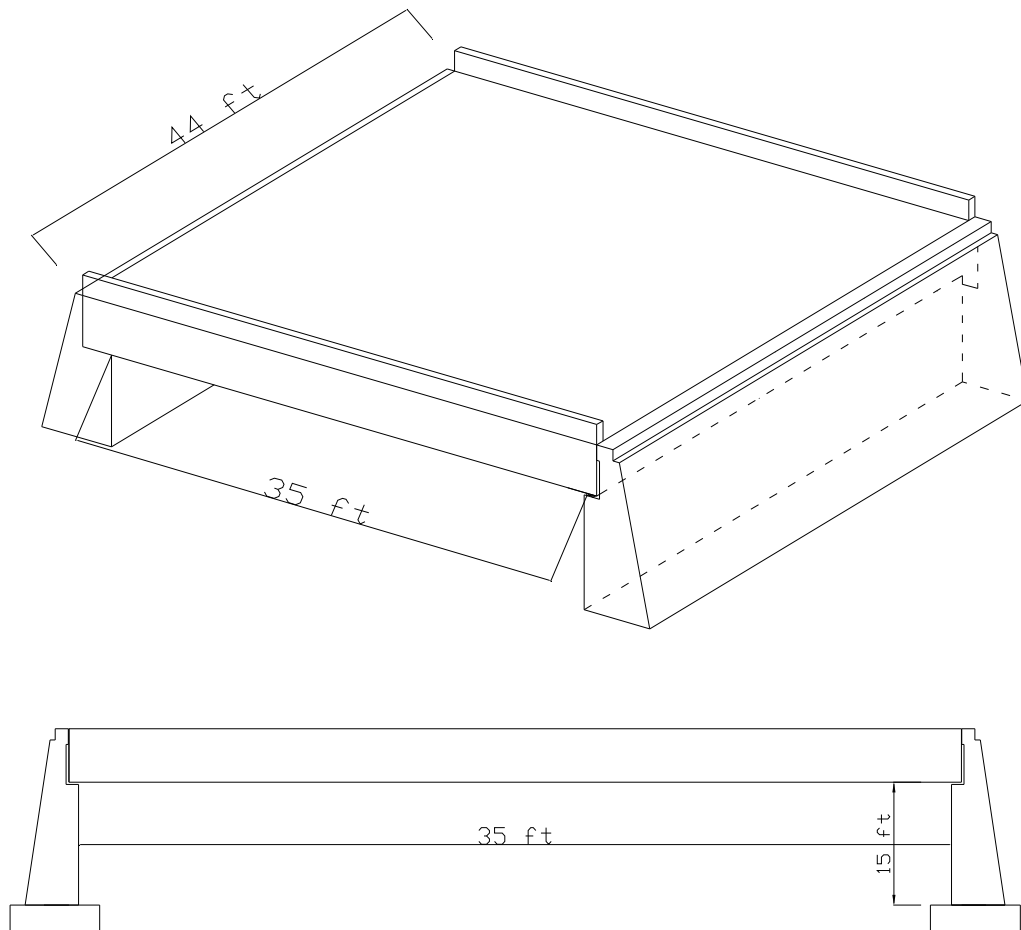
The Perspective & Elevation View of The Model Bridge.
